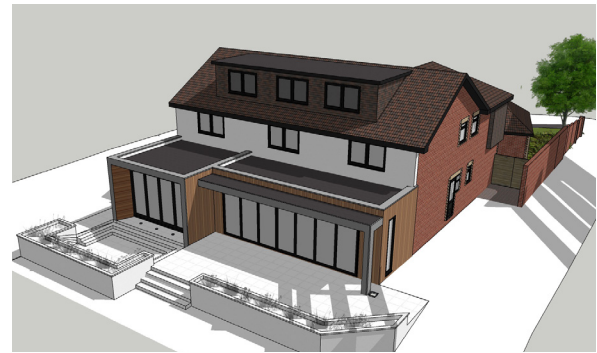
Application 22/01690/LDCP Proposed 3D Images
